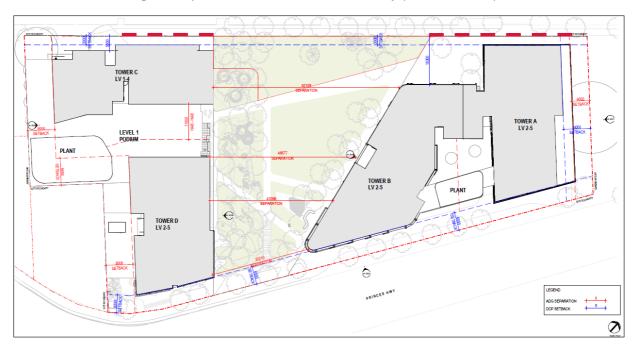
| Building layout and separation showing DCP (blue) and ADG (red) recommended setbacks (Note: the DCP recommends a nil podium setback to the north west Eden Street frontage (red dash) (Base Source: Applicant's RtS)
